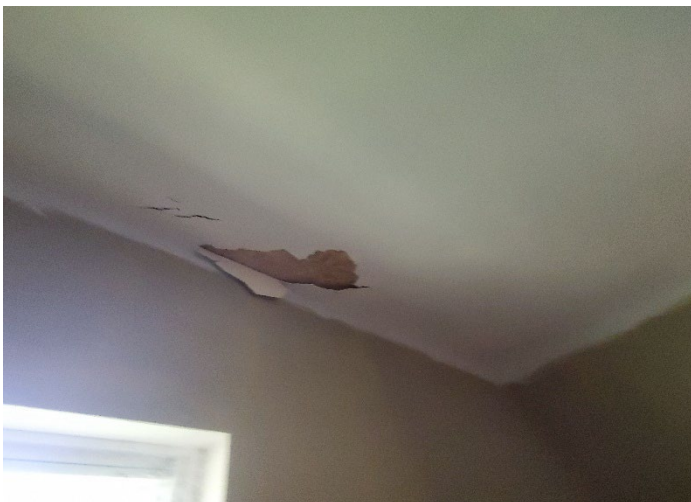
Ceiling with textured coat over plywood located in back left room.
